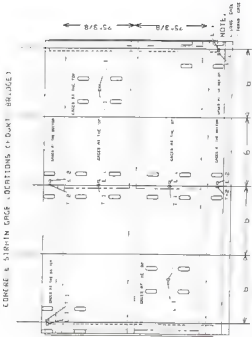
Concrete Strain Gage Locations (Fourth Bridge)
